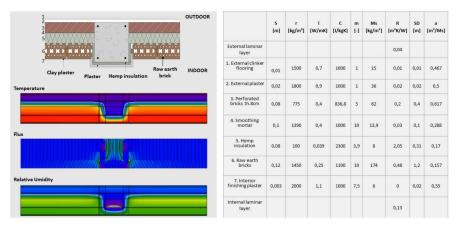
Wall stratigraphy and thermal properties: infill pillar thermal bridge correction with hemp insulation.
